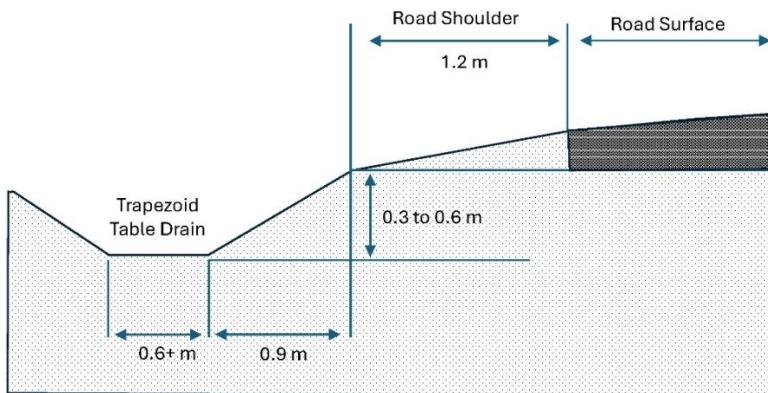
Minimum drain depth and width (ARRB, ARRB 2020).
